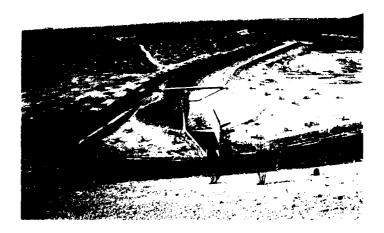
Looking downstream at main access road, energy dissipator, gaging station bridge, and outlet channel from crest of dam. 19 April 1985
